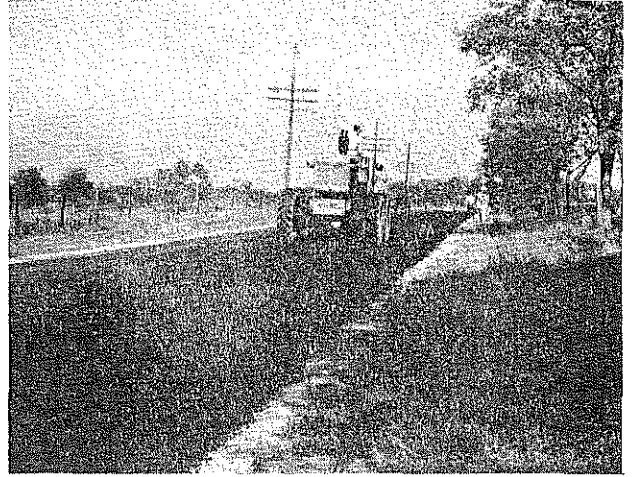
Spreading and shaping a second run of binder material to improve the finished section.
